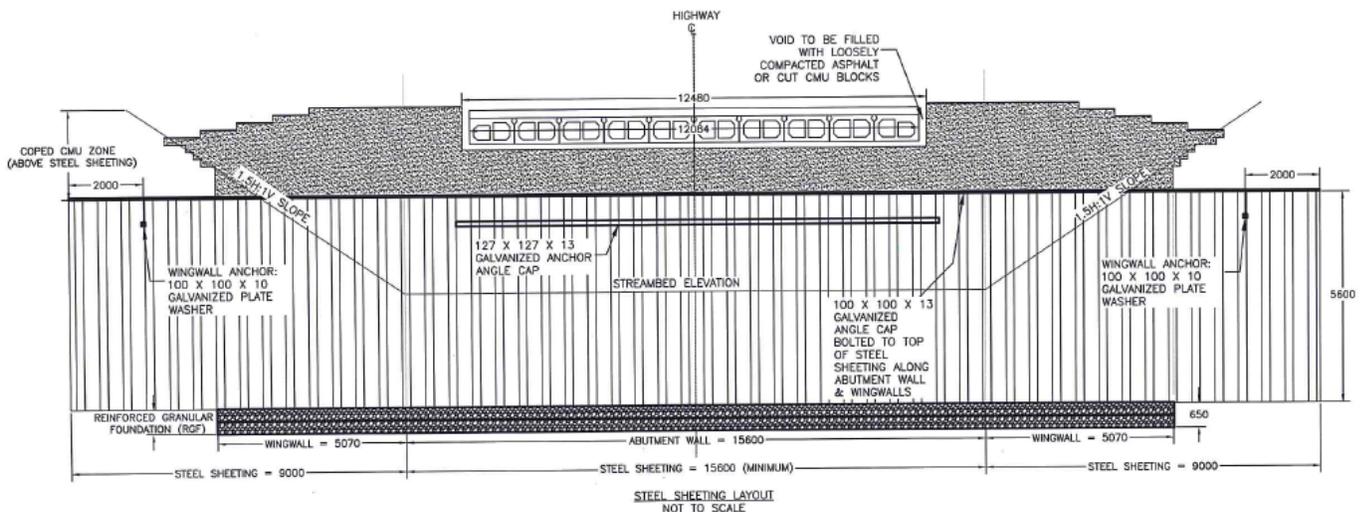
Government of Yukon Original Tendered Design, Wall Layout
